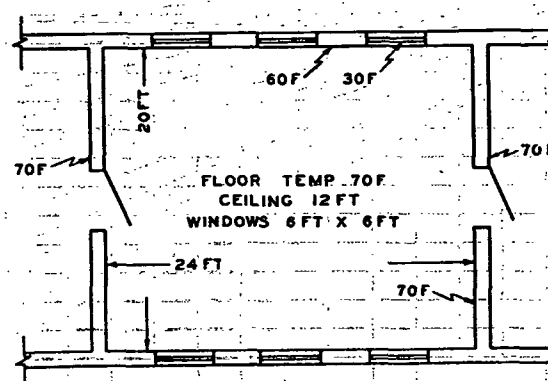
ROOM PLAN USED FOR ILLUSTRATION OF METHOD OF DESIGNING A PANEL HEATING SYSTEM
